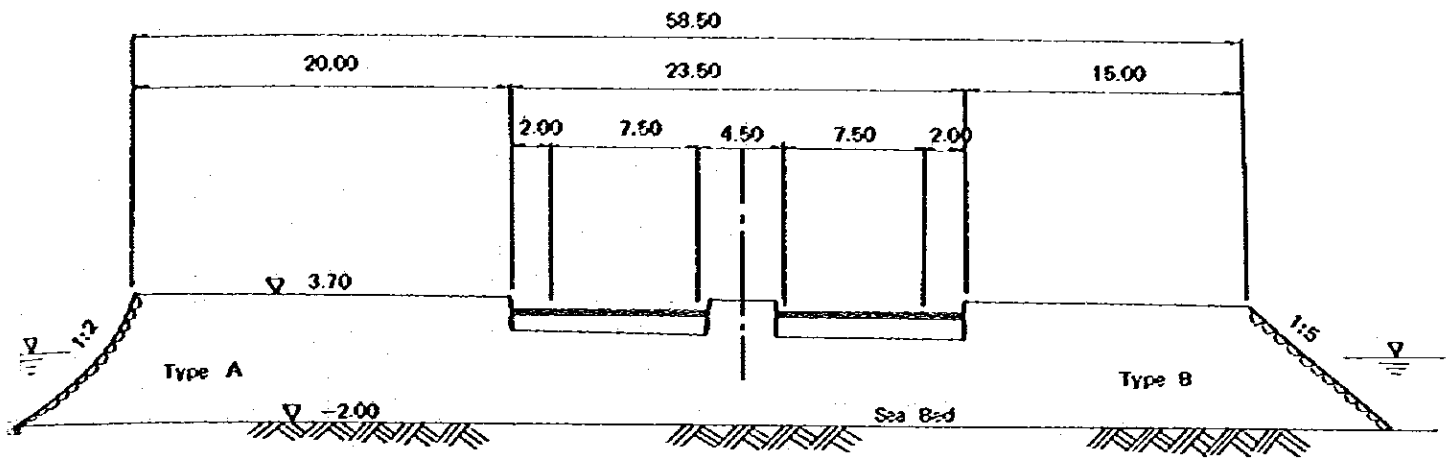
TYPICAL CROSS-SECTION OF THE ROAD
